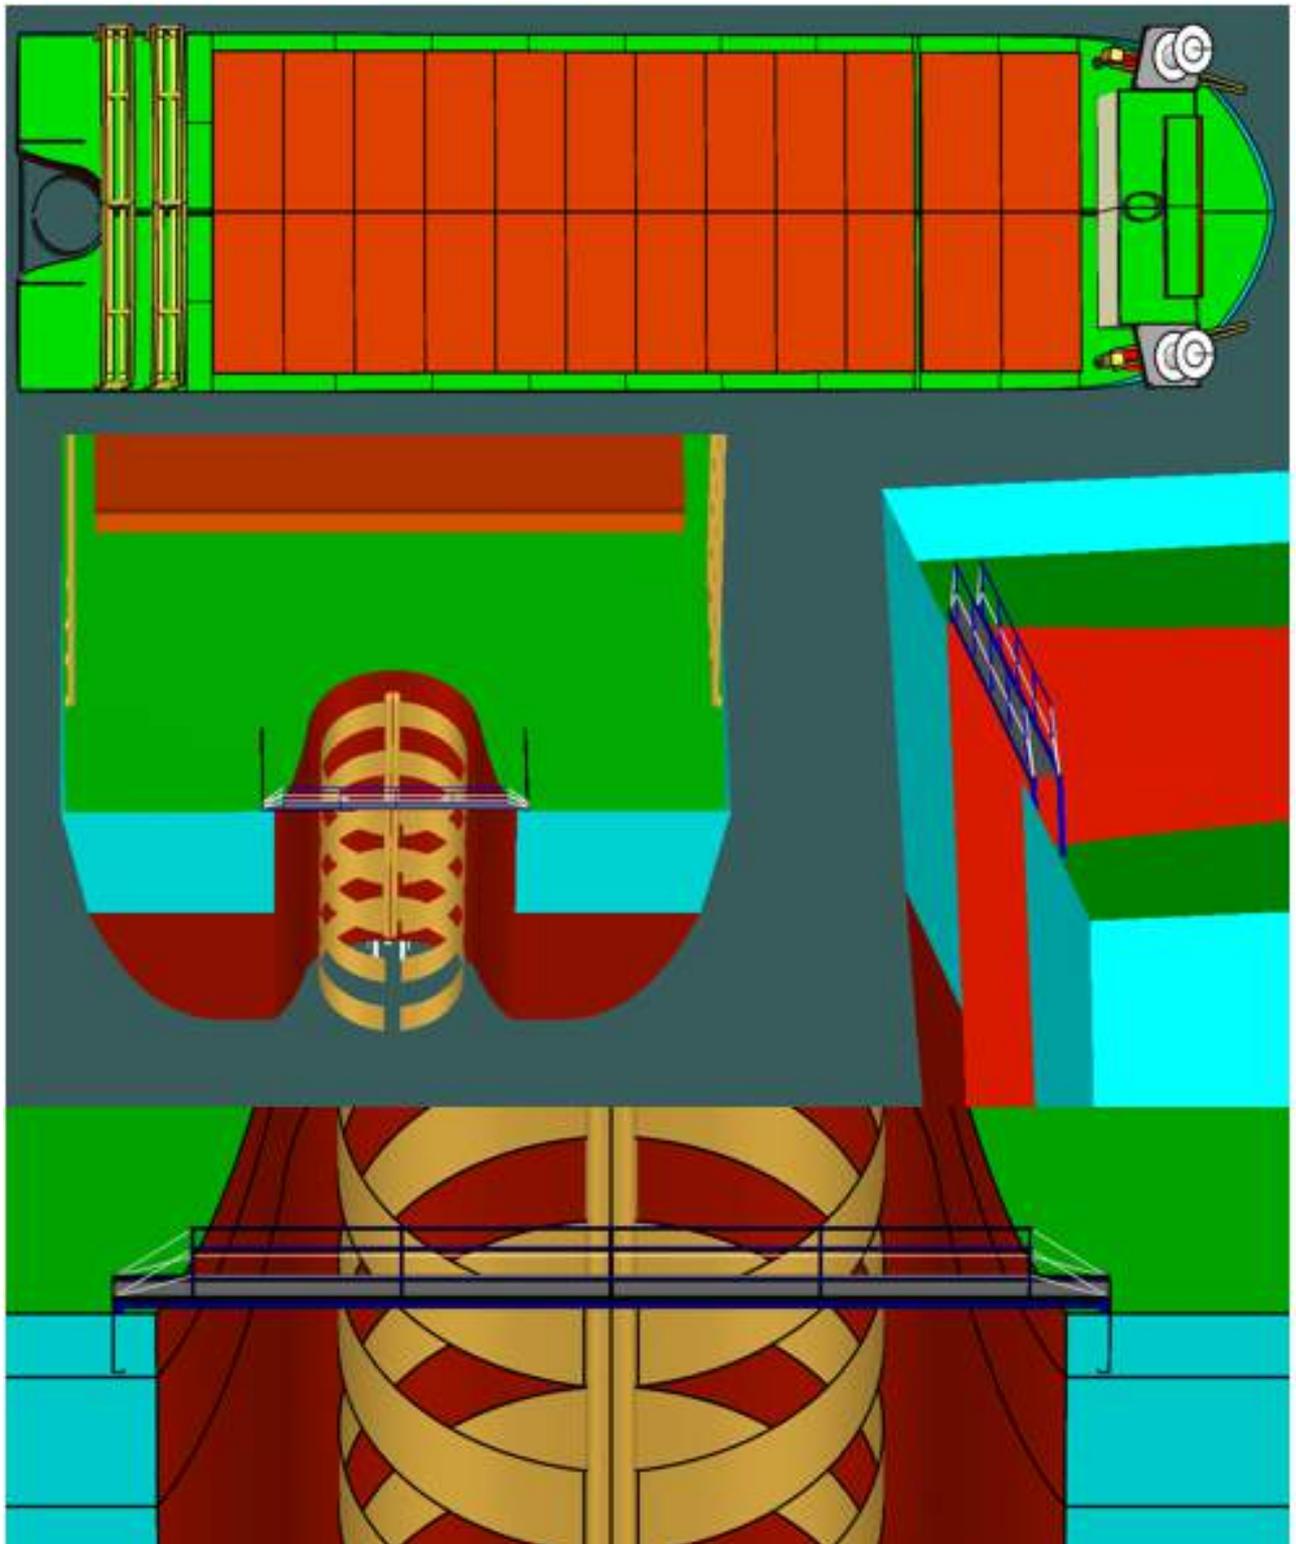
Mobile Access Platform for Cutting MP/TP
